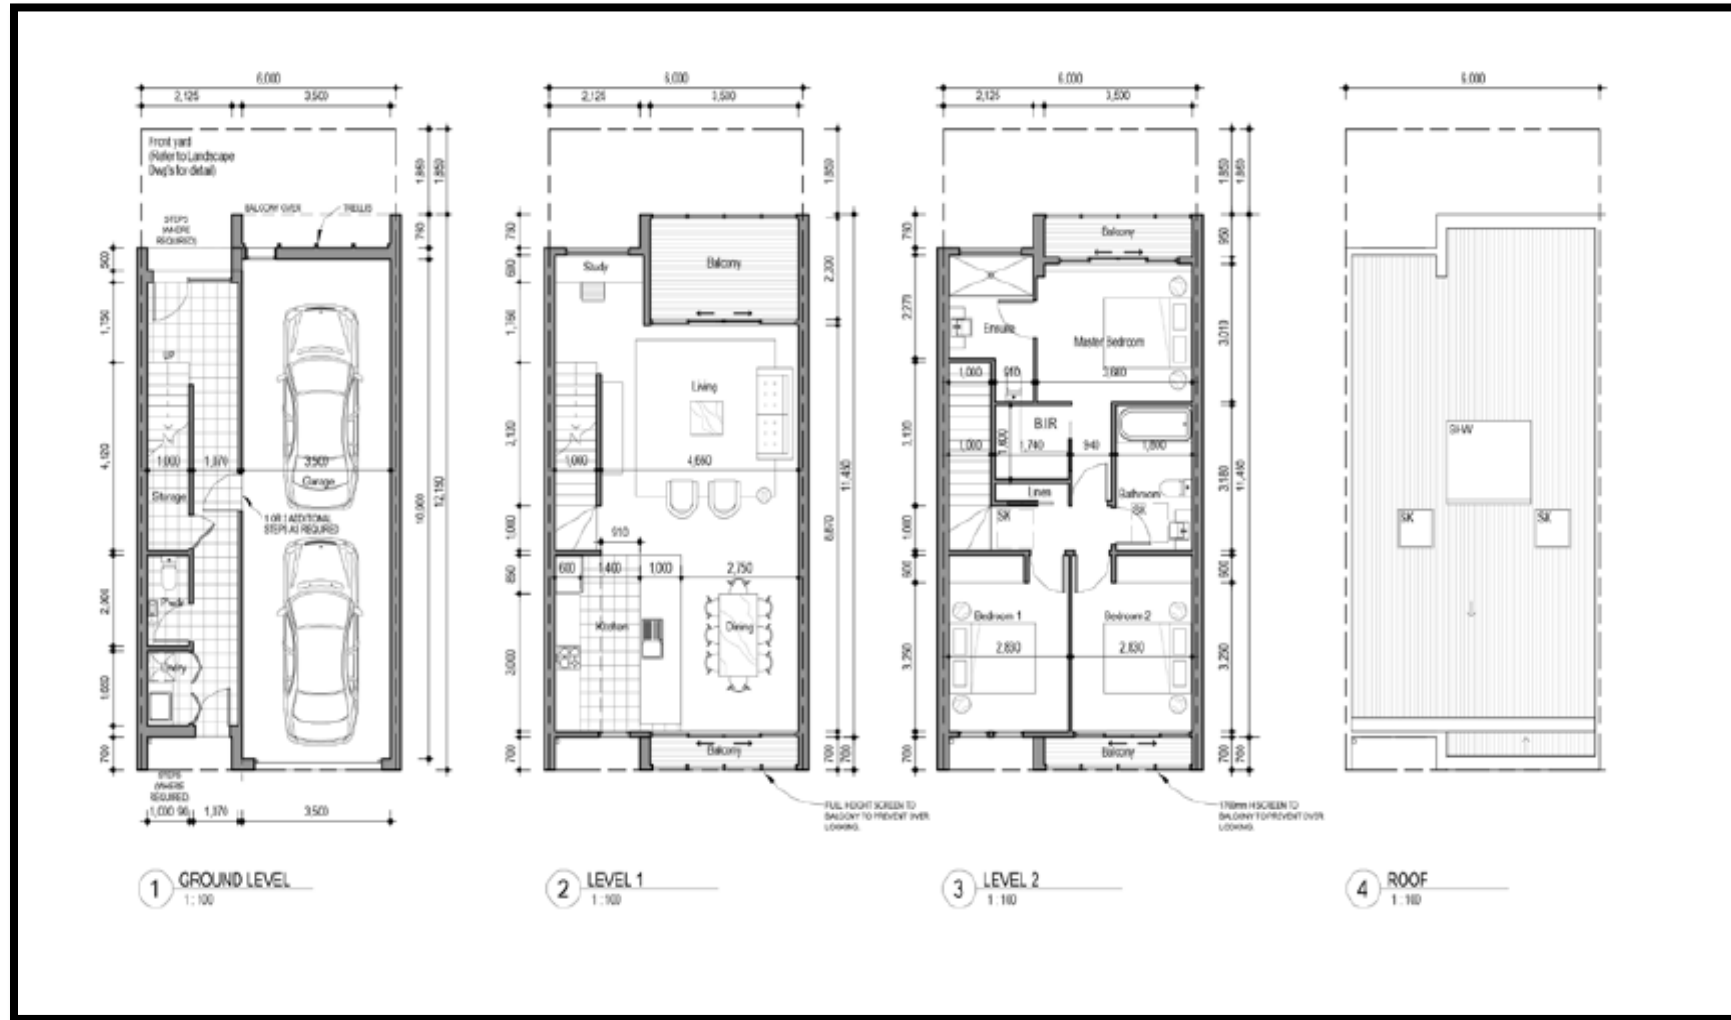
A Typical 18FT x 60FT Townhouse Layout Example
